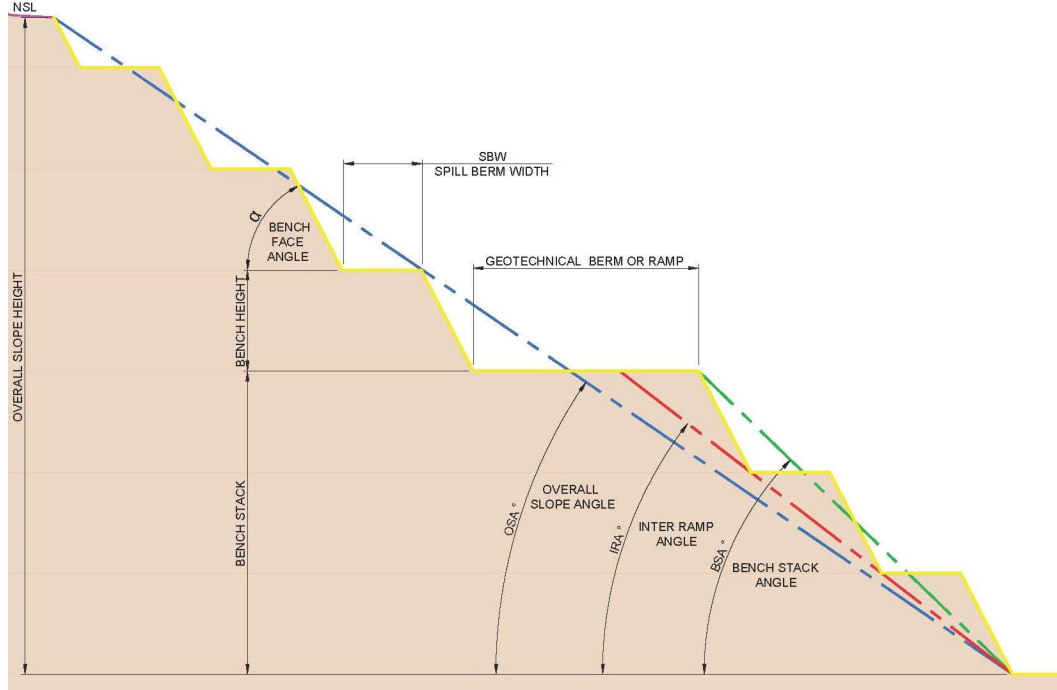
Pit slope design elements, geometries, and terminology (source: Read & Stacey, 2009)
